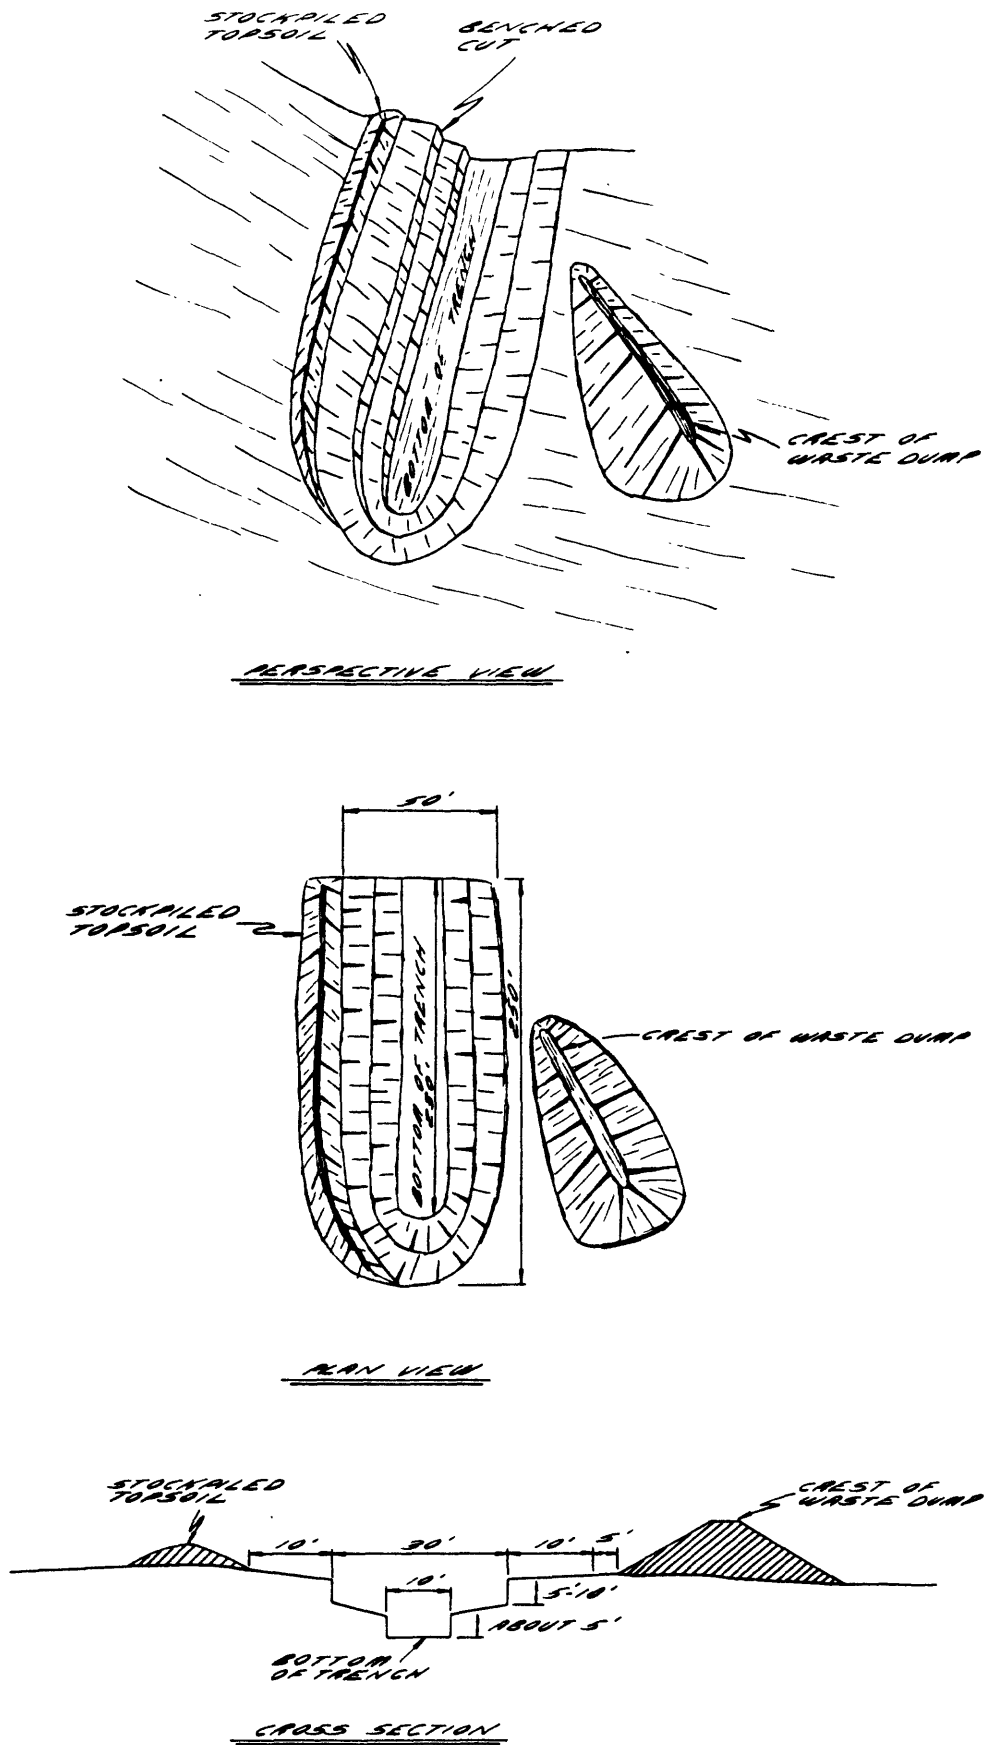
Perspective, plan, and cross-sectional views of trench CP-75. Diagrams not to scale.
